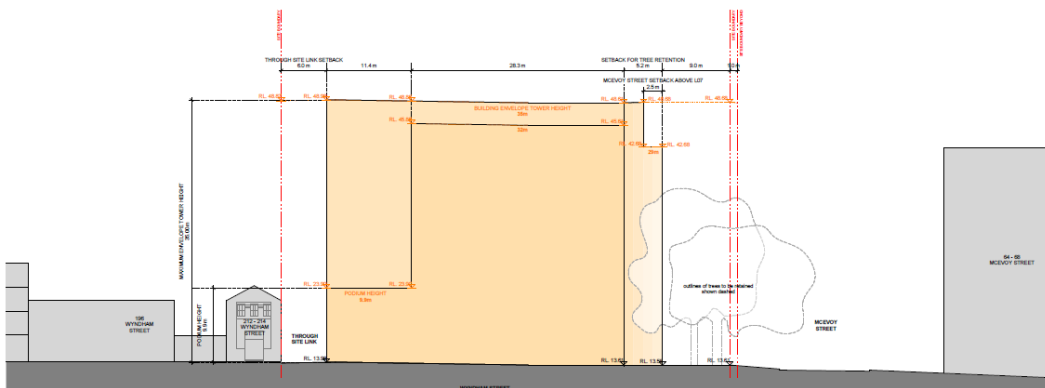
Proposed envelope - western elevation (Wyndham Street)
